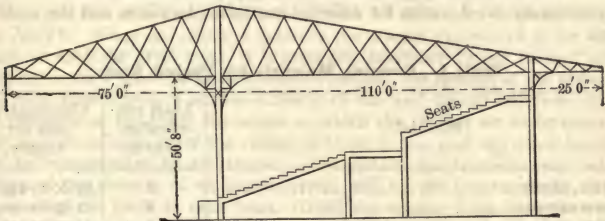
Cantilever Truss, Grand-stand, Monmouth Park, N. J.
